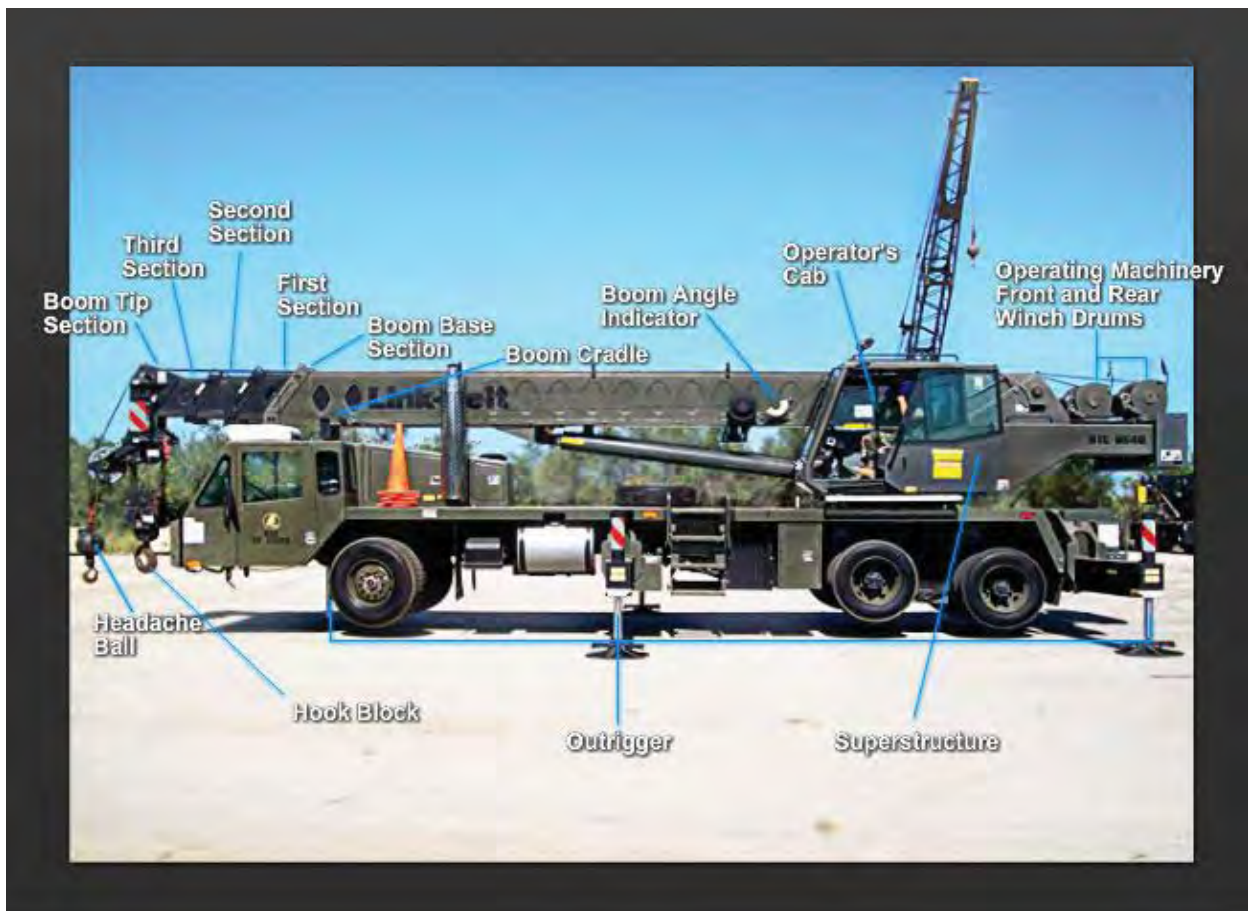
Major components of a telescopic boom truck-mounted crane.
